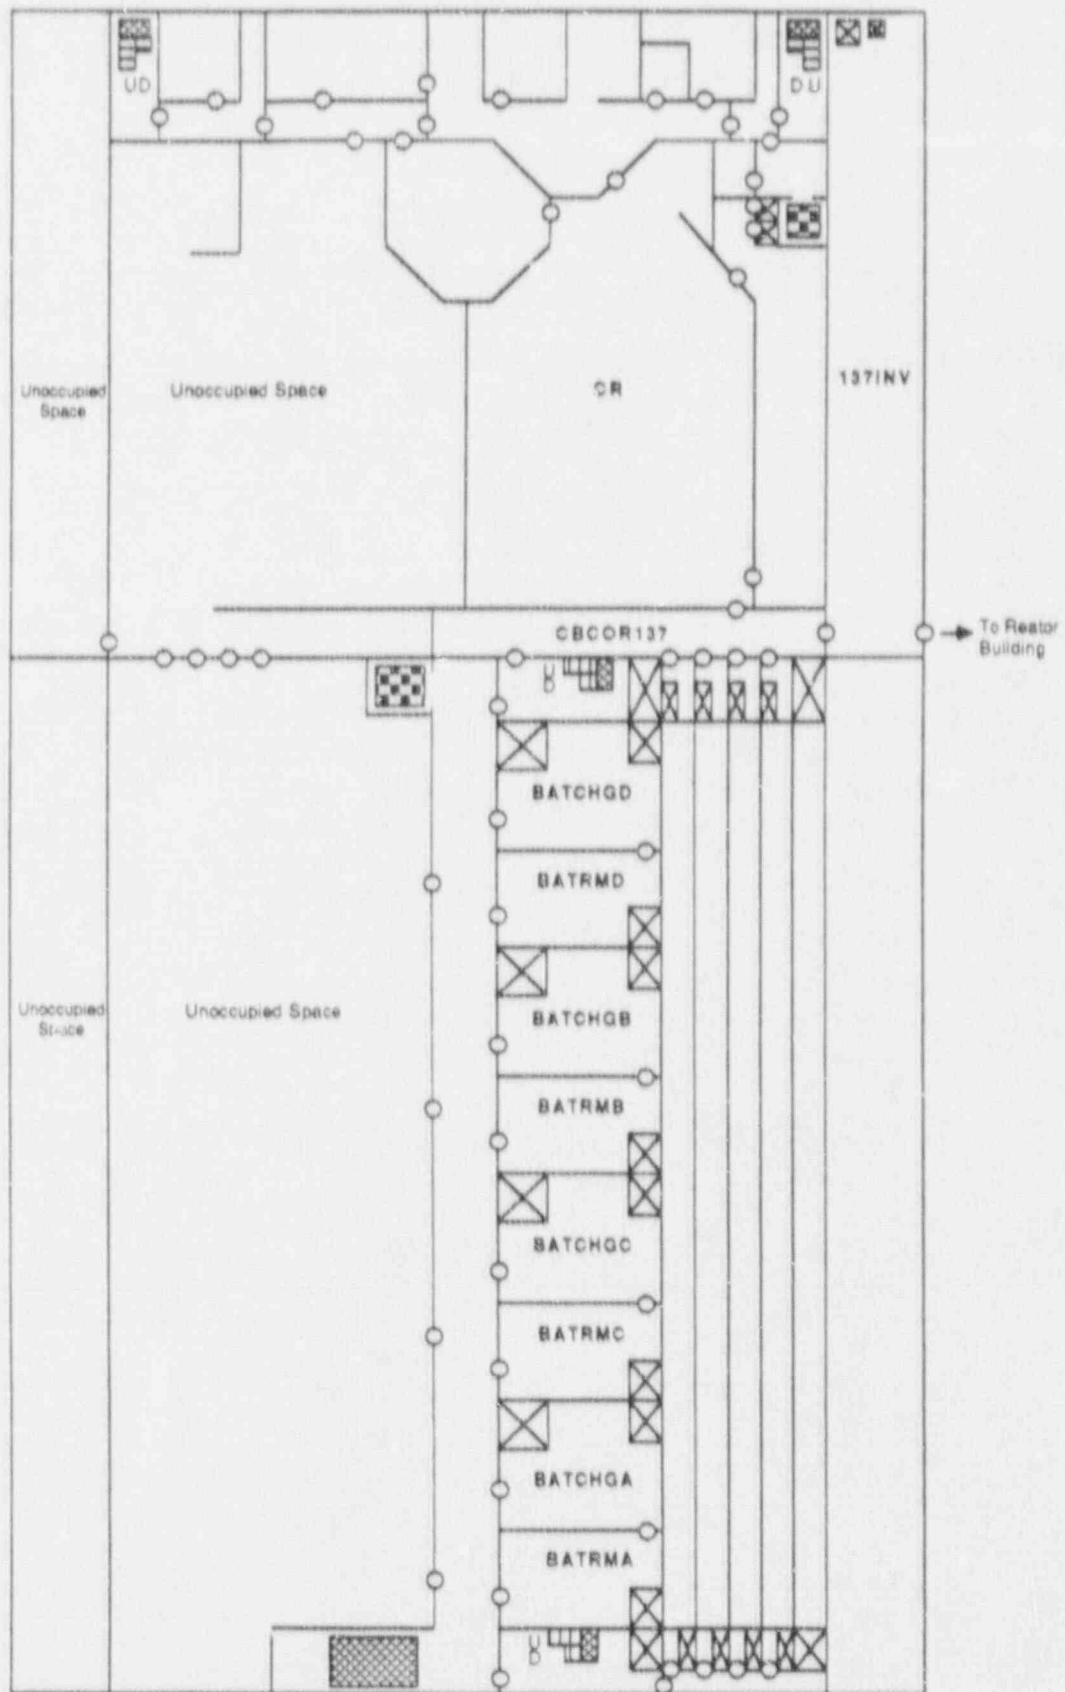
Hope Creek Control/Diesel Building Elevation 146'-0" and 137'-0'
